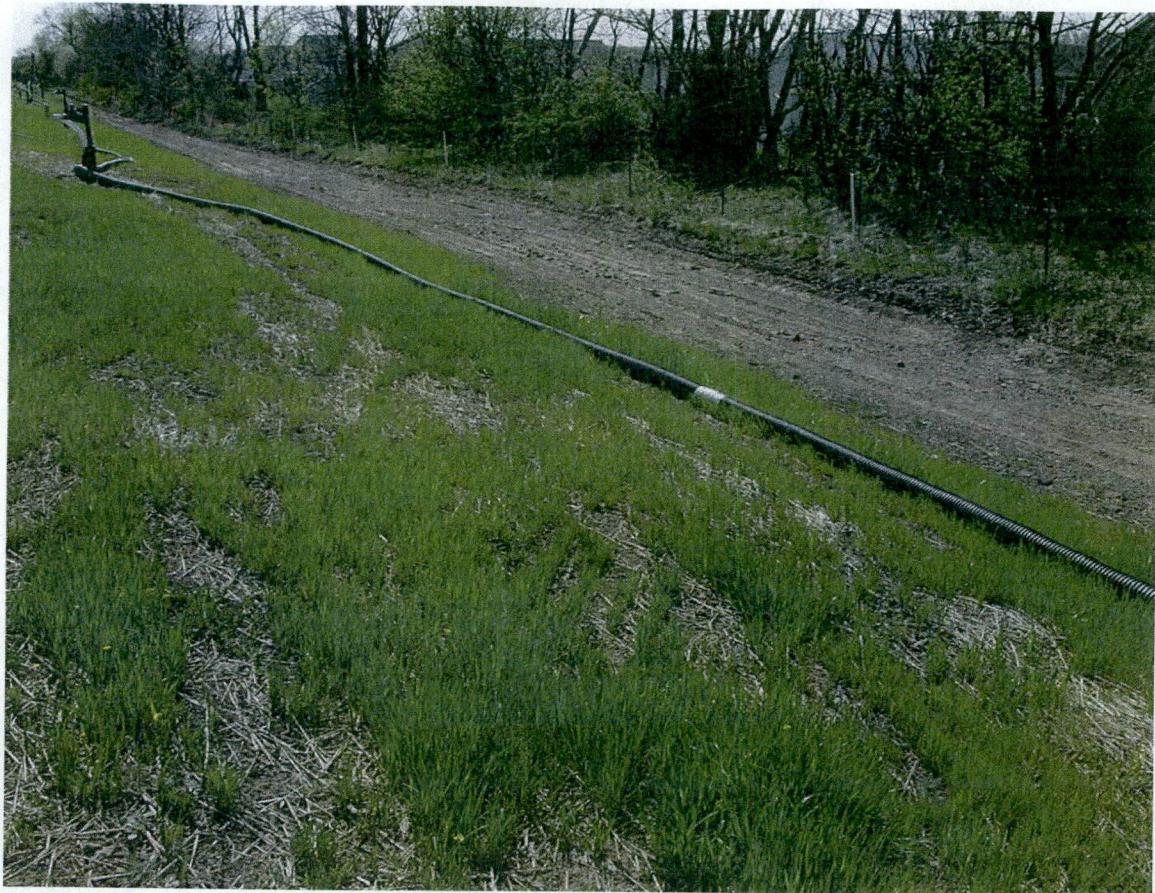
View of dirt access road, original vapor recovery piping, and stressed vegetation on the southern side of the landfill.
